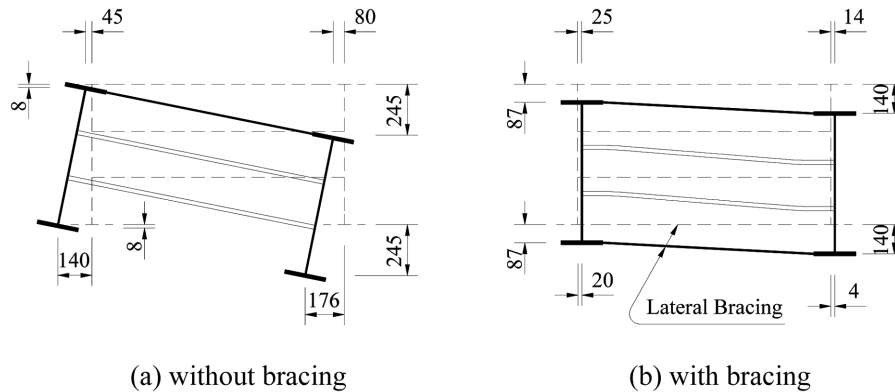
Deformed shape at the center of span : Damaged condition (unit: mm)
